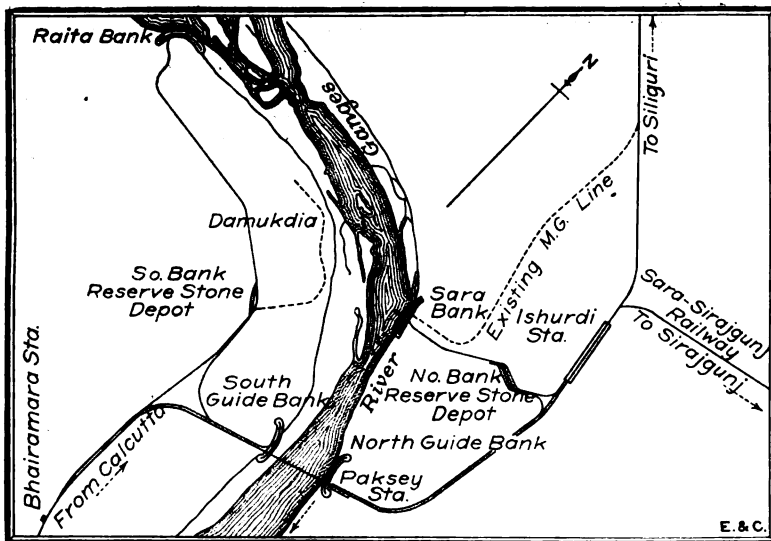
Site of Lower Ganges Bridge and River Bank Protection Works.
